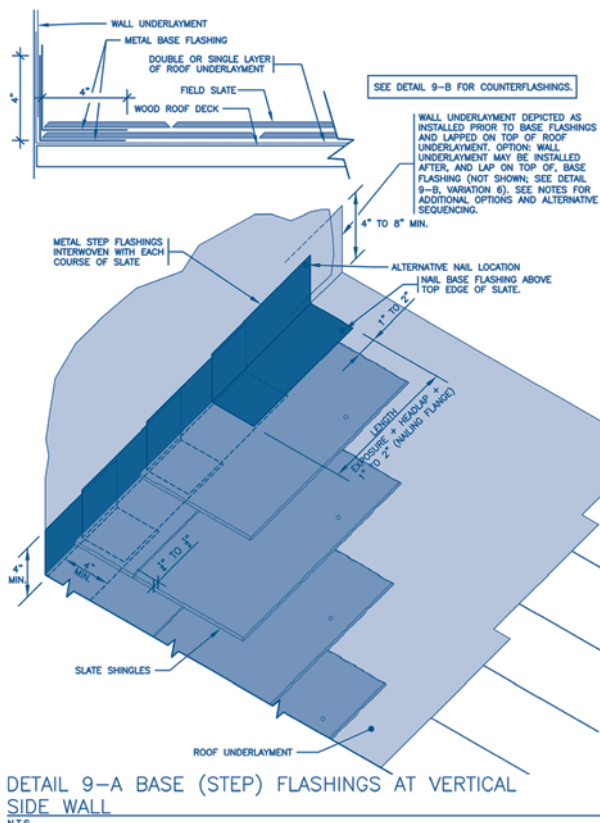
Detail 9-A from *Slate Roofs: Design and Installation Manual*.
